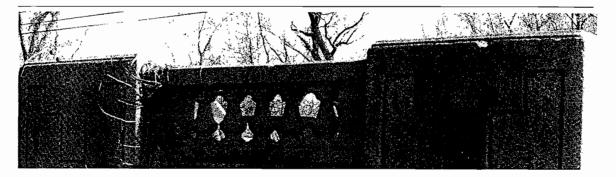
Balustraded railing, artictic treatment of a non-structural element.
